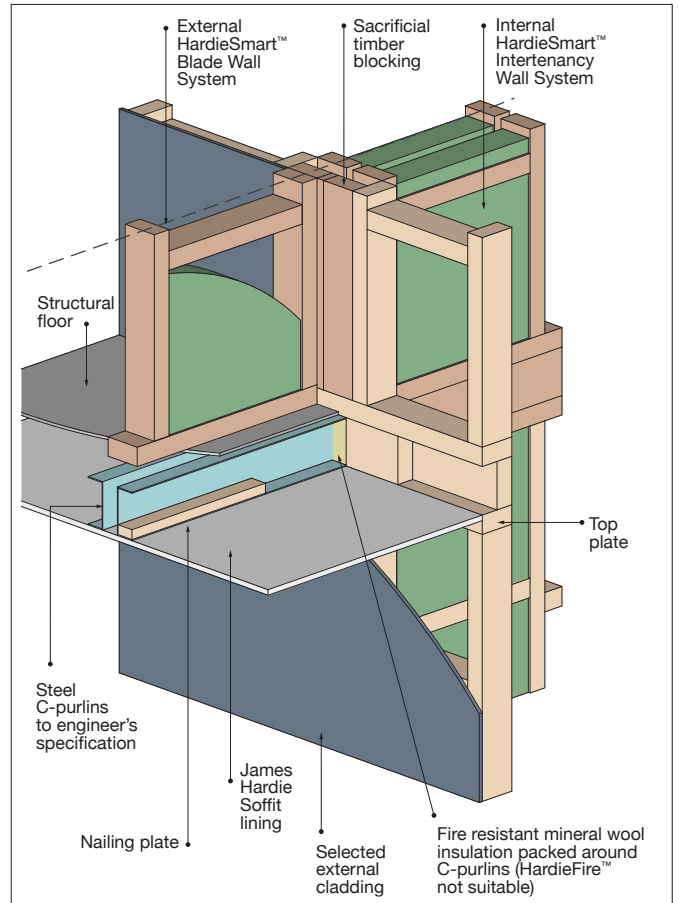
A HARDIESMART™ BLADE WALL SEPARATING CANTILEVERED BALCONY, SAME TENANCY BELOW
